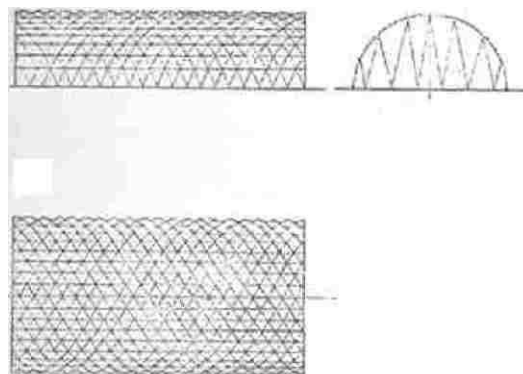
Plan, section and elevation of the tennis hall, Ref 1
